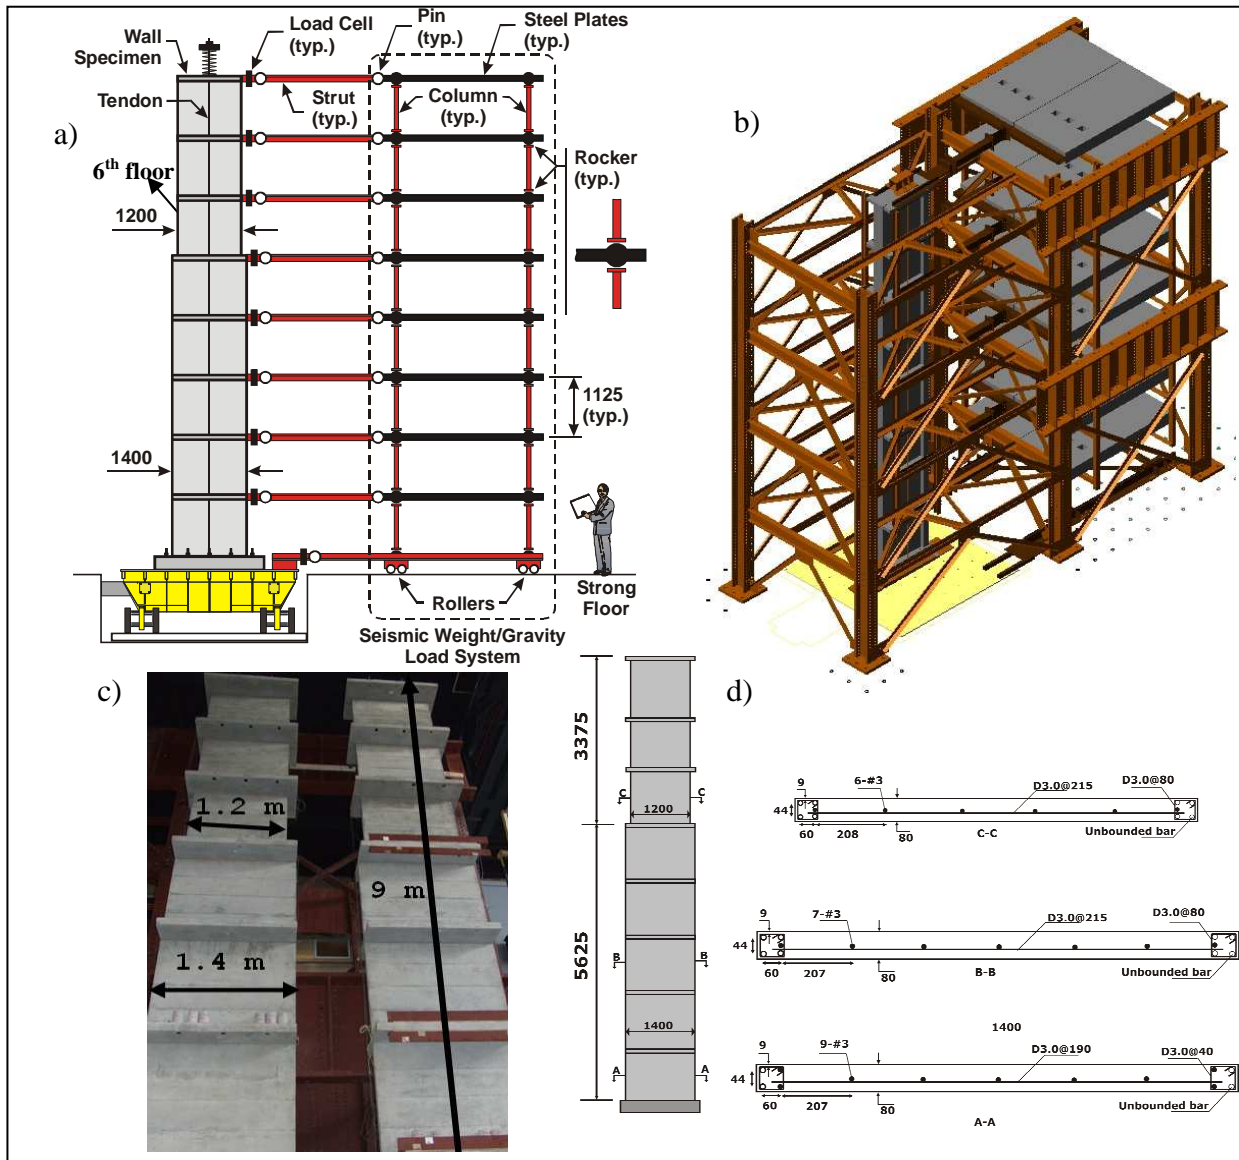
a) Test specimen and seismic weight/gravity load system; b) Complete test setup with stabilizing steel frame; c) model wall; and d) Cross section of model wall
